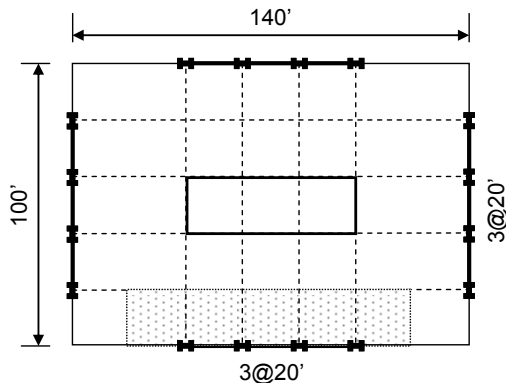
Plan view of typical archetype building with perimeter moment resisting frames.
